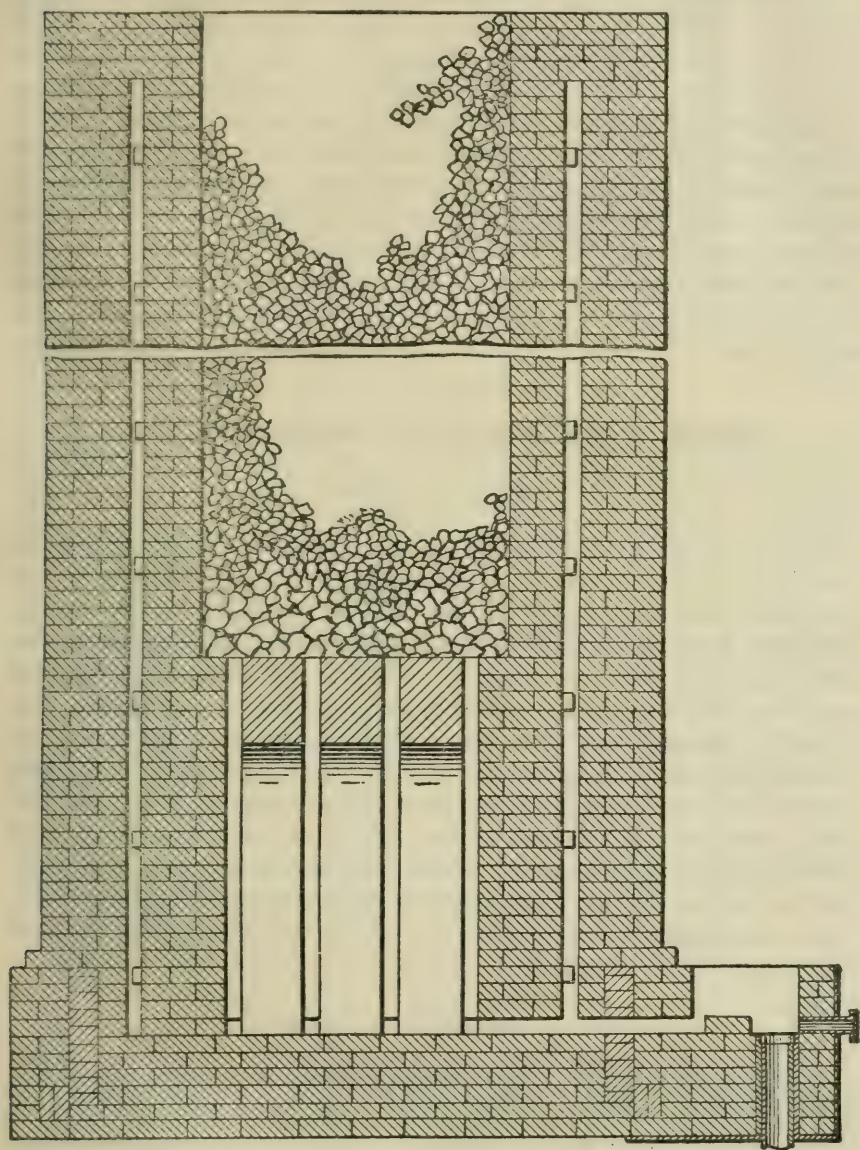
Kalberry acid-proof masonry, elevation.
